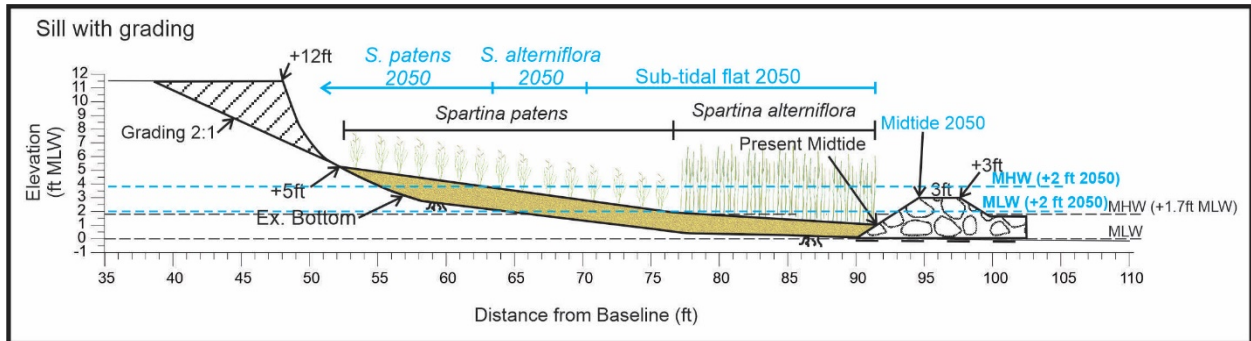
A high bank sill system typical design cross-section showing the adaptation to 2050 tide levels (blue). The top of the bank can be graded which will allow the marsh to migrate up the bank. The area behind the structure would become an intertidal and subtidal flat and only top of the structure would be at about mid-tide. Sill system at Occohannock on the Bay in Accomack County, after Hardaway et al. (2018).
